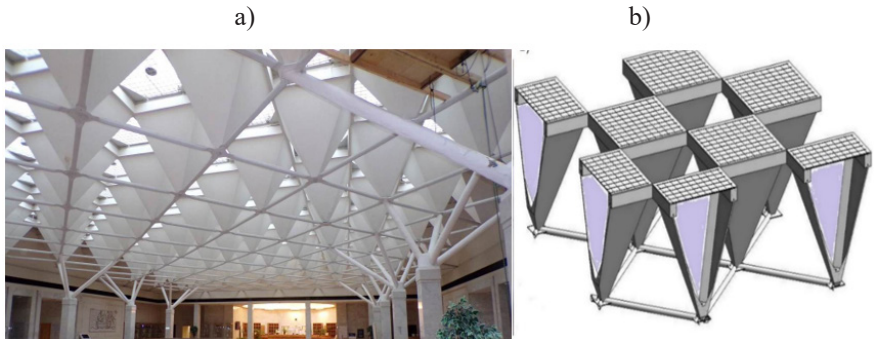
Hybrid structural roof with pyramidal elements with steel fiber concrete faces and reinforced concrete bases attached to a tension chord: a) roof for the building of the Russian National Library in St. Petersburg; b) BIM model of the hybrid roof structure.
